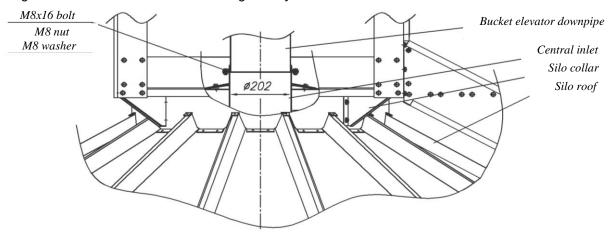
Correct installation of loading pipes in the roof collar of silos of the FBIN7 type.
